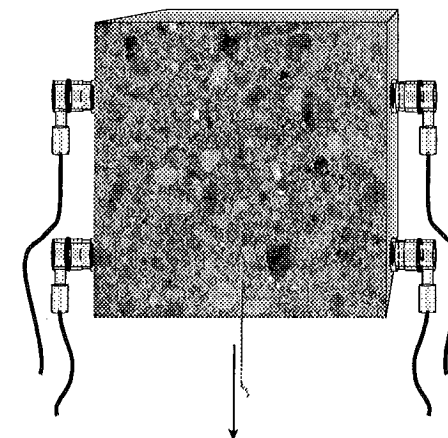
Specimen cross-section with transducers and pullout force indicated. First test series.
